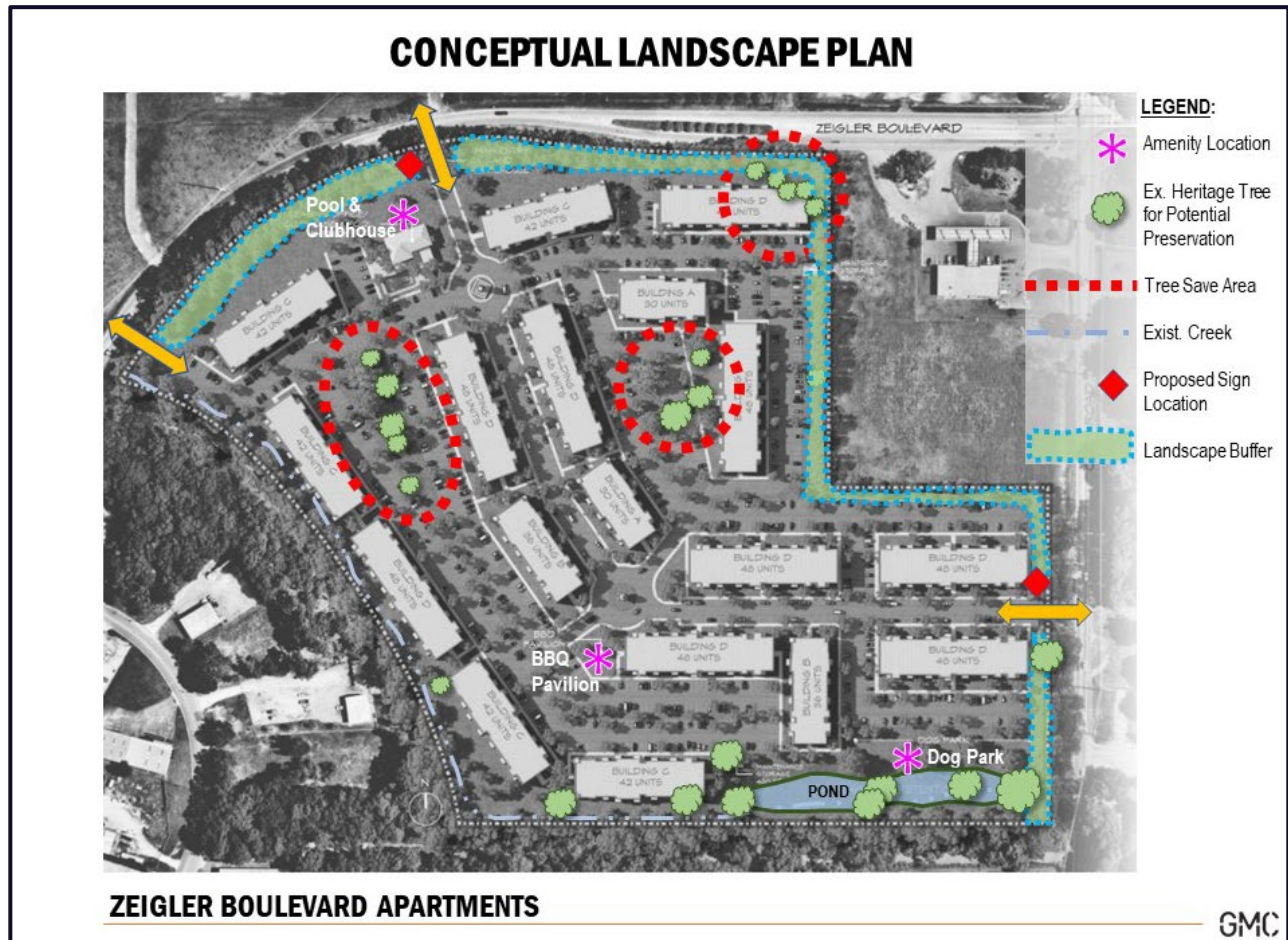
Conceptual Landscape Plan. The PUD proposes multiple landscape islands within the surface parking areas and perimeter buffering. Existing Heritage Trees will be preserved in place where possible. Plan prepared by GMC.
